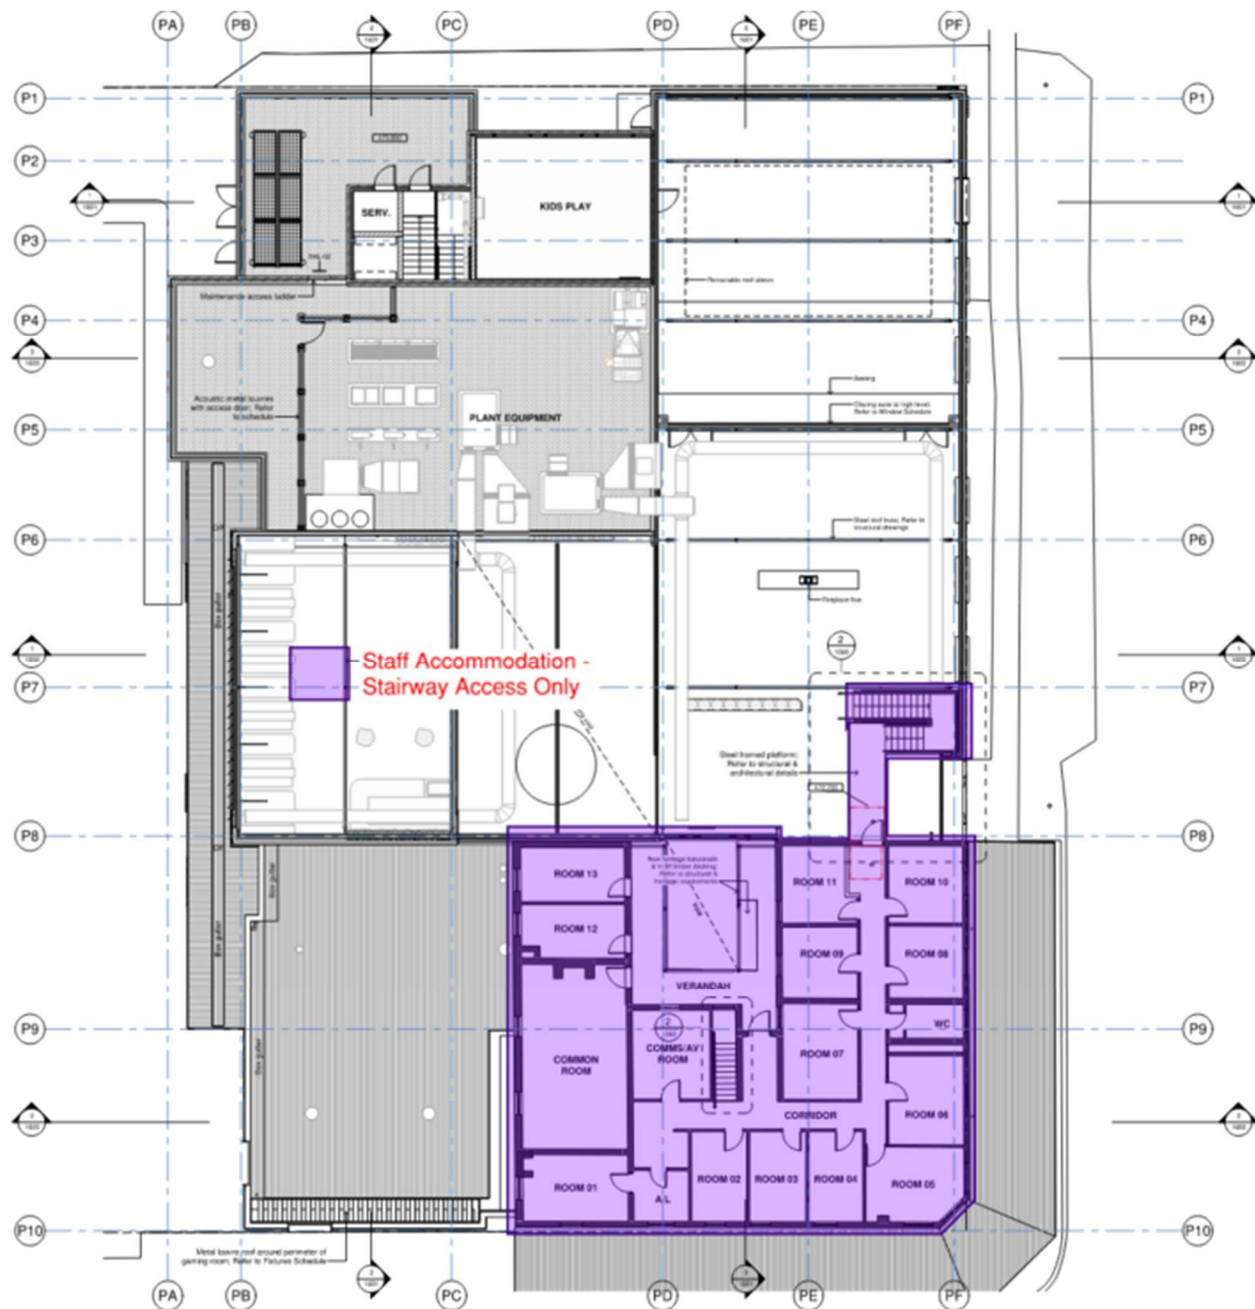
General Arrangement Plan – First Floor Staff Accommodation
